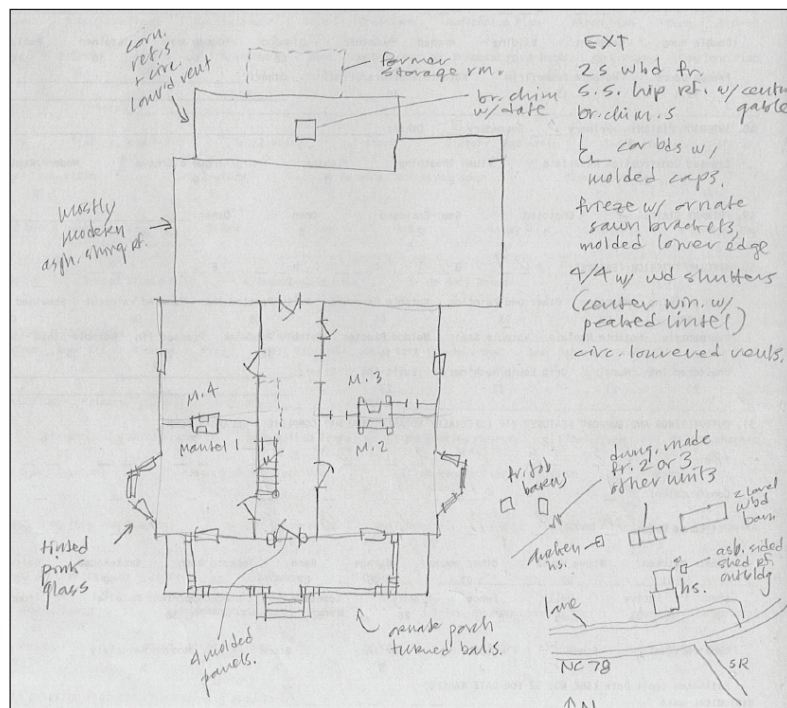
Kenneth H. Worthy House, Site Plan, Sketch by Daniel Pezzoni (1992c)
